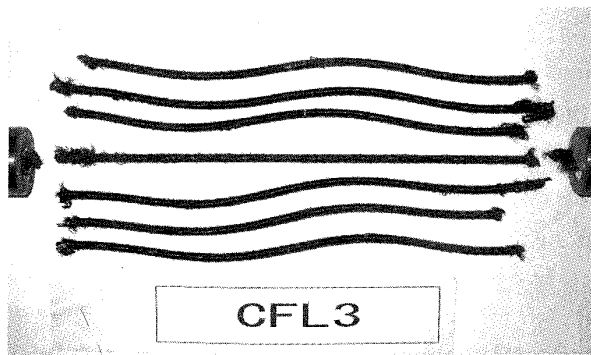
Photograph of fractured cable at the high speed test (0.10 m/s).
